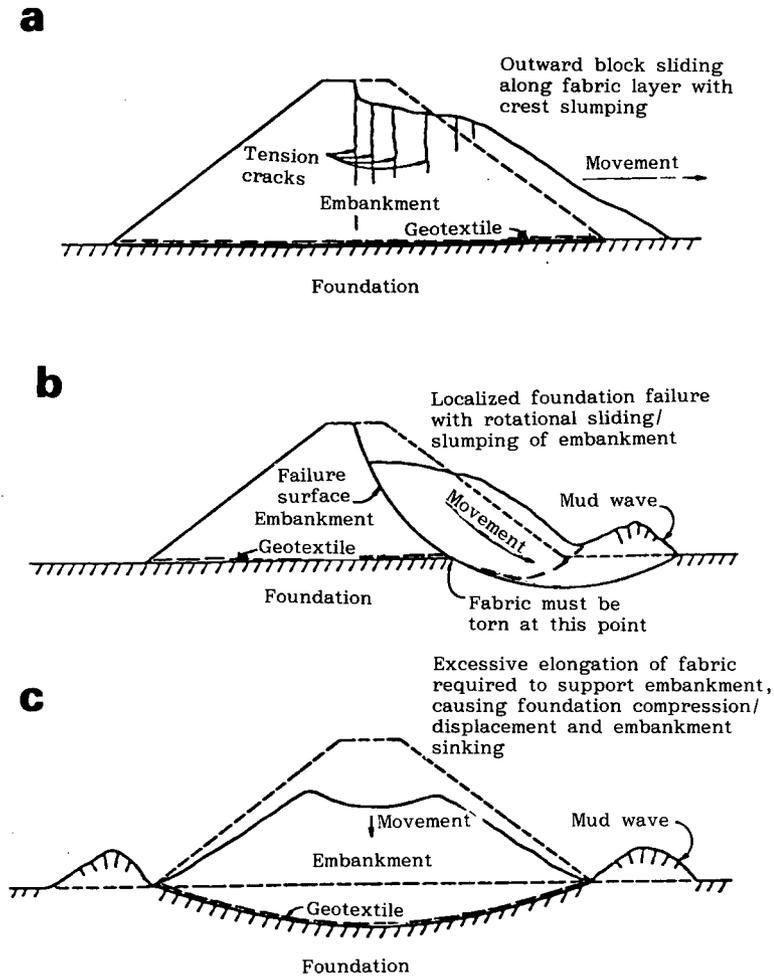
Possible modes of geotextile-reinforced embankment failure (after 149 and 206).
